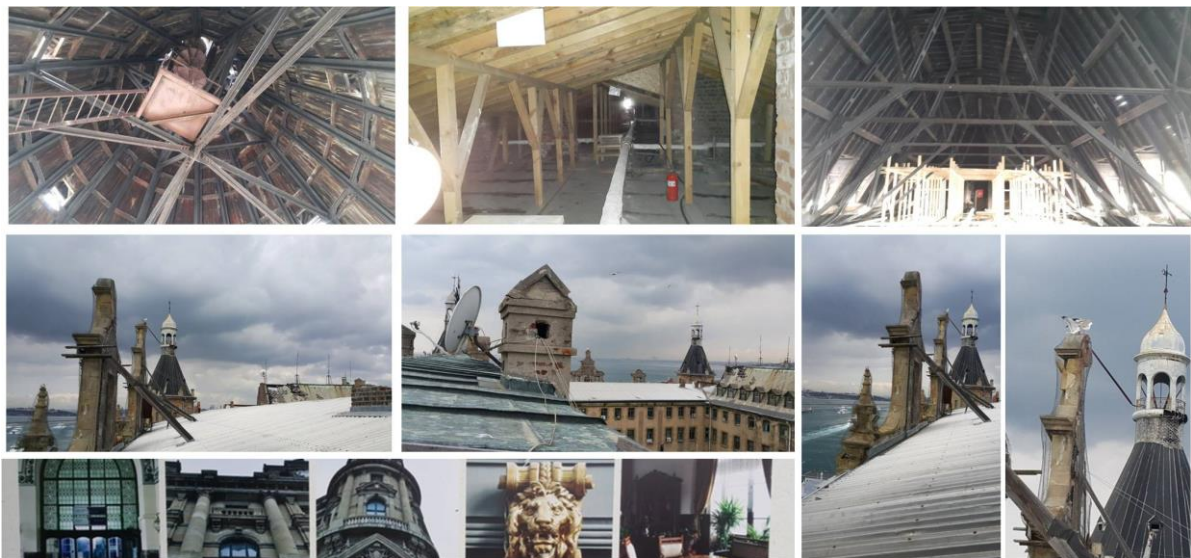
Precautions Taken on the Roof after the 2010 Fire
